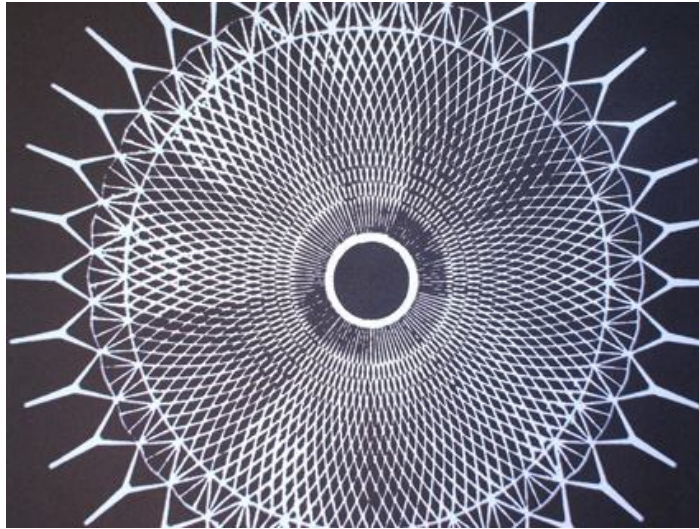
Plan of the dome and its supporting struts, small sports place, Rome (Nervi).
